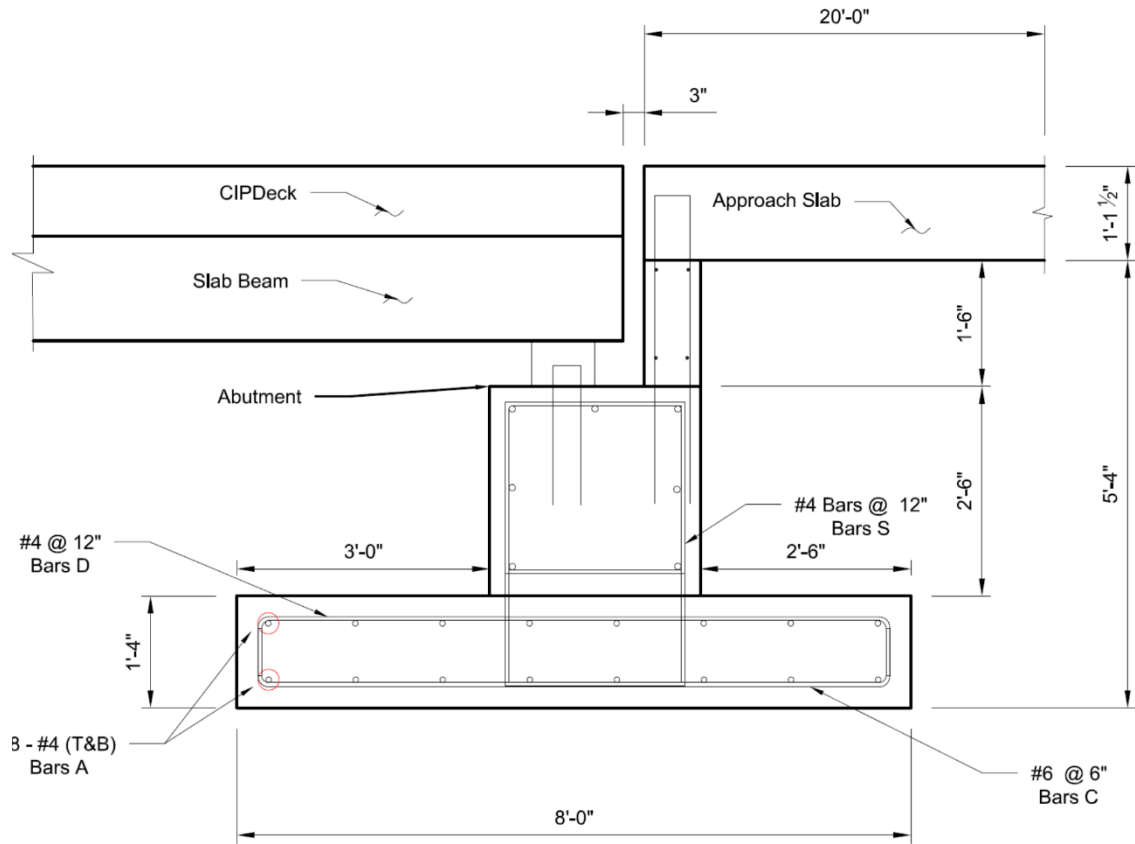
Reinforcement Detail of Footings and Abutments.
